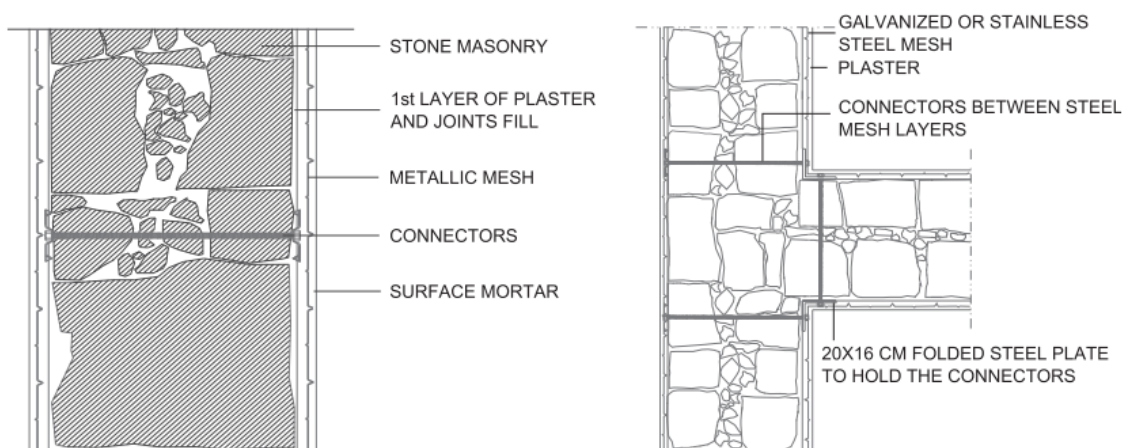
Stainless-steel mesh with corner reinforcement [11]
